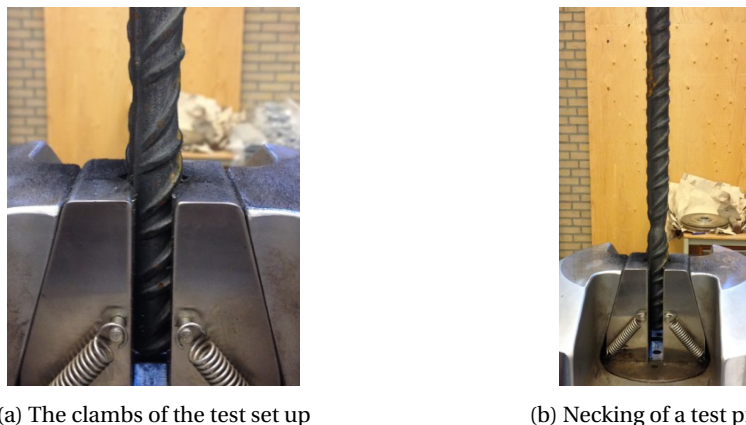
Details of the tension tests performed on the reinforcement bar with a diameter of 20 mm.
